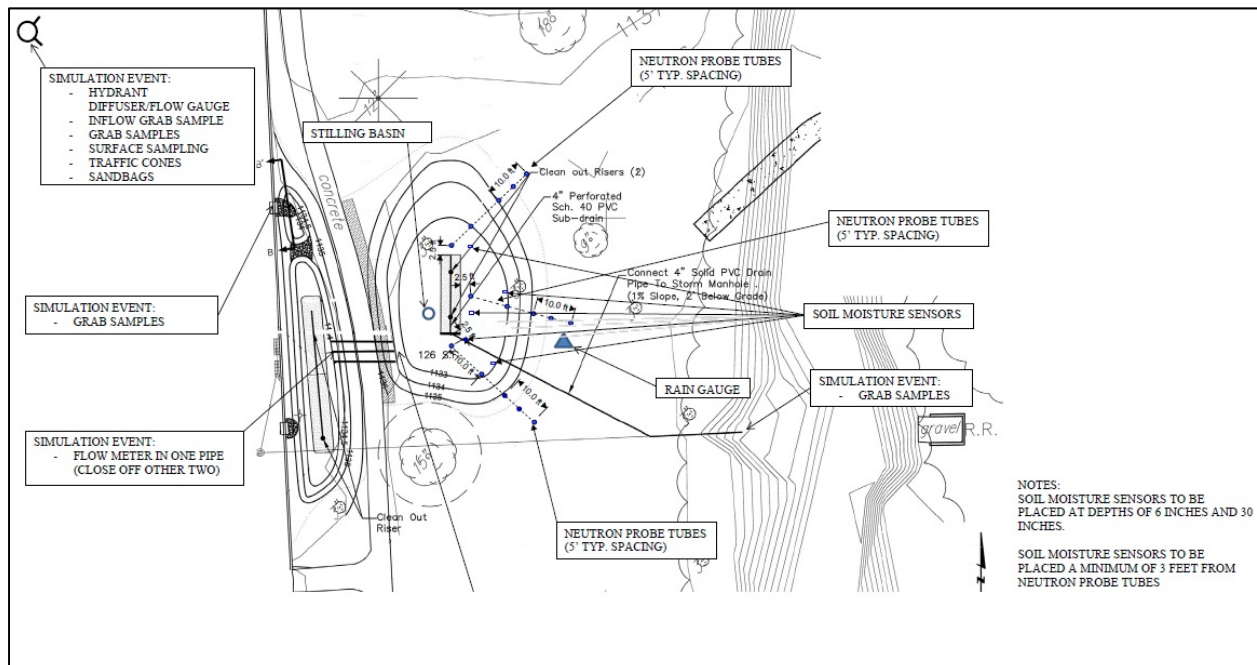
A. Site plan for Orchard Park bioretention system monitoring equipment.
